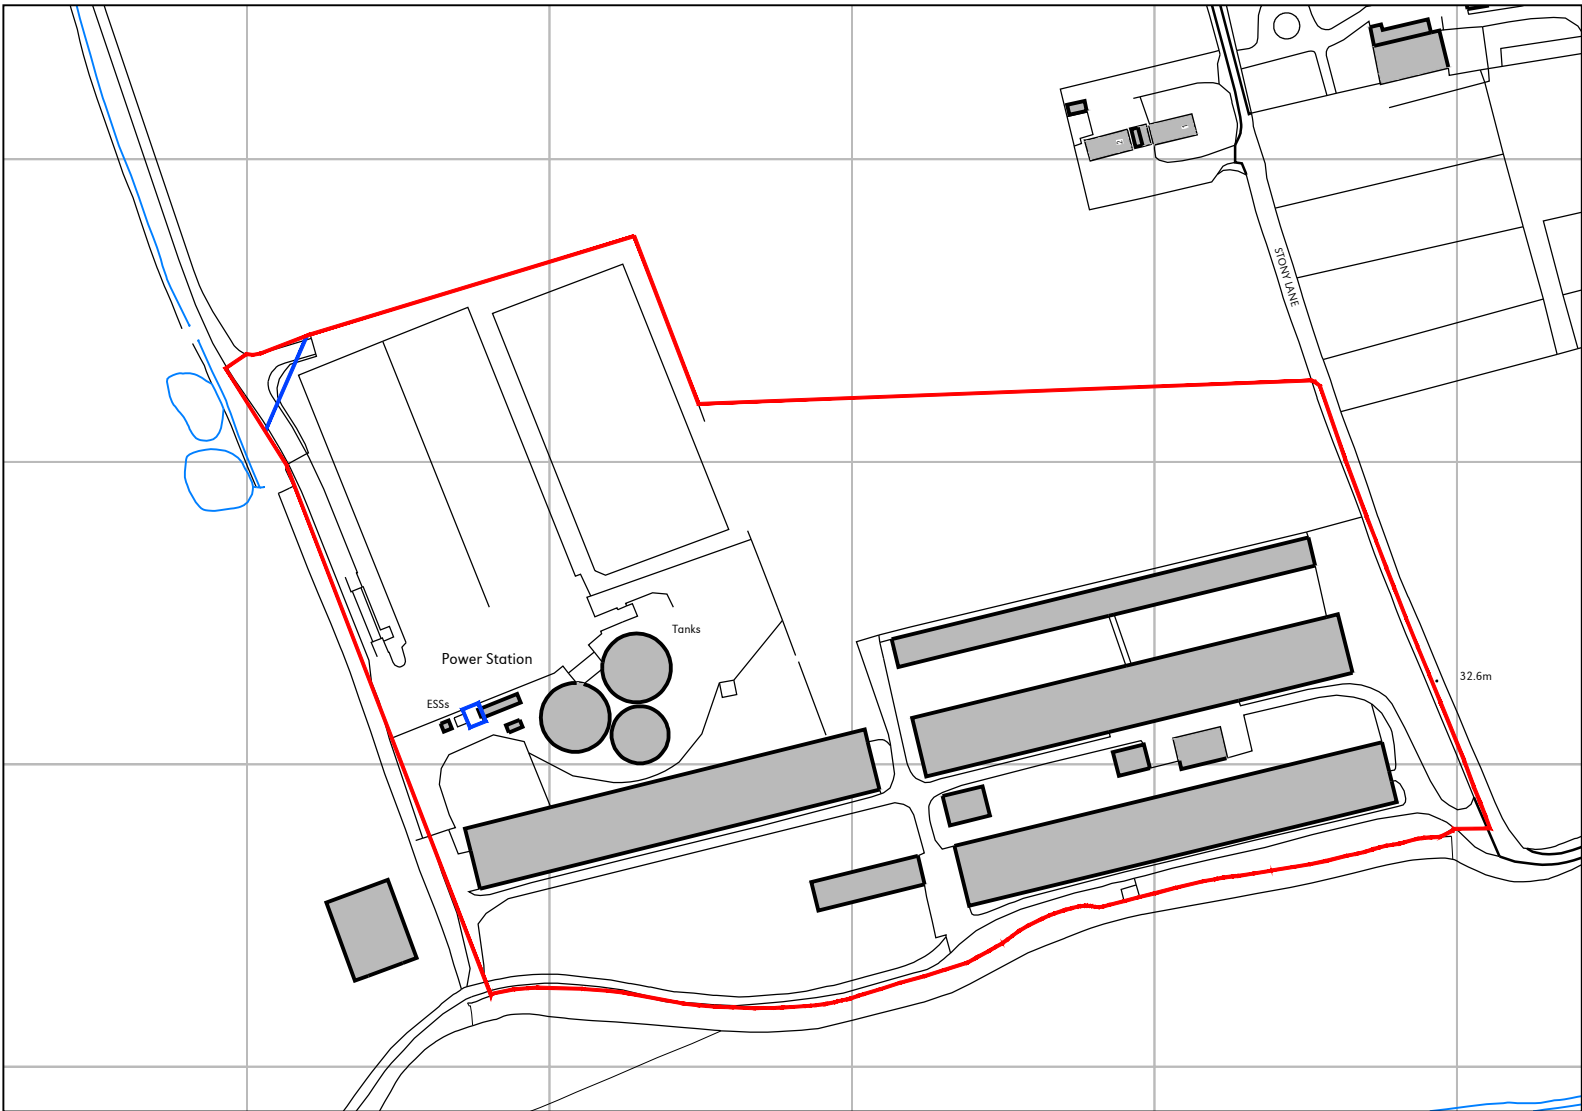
Emission Point Plan (BioConstruct / B202103 / A15)
